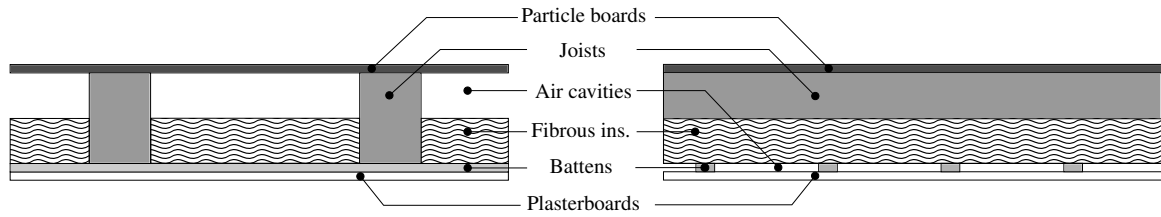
Schematic layout (left and right views) of a C1 floor according to [135].
